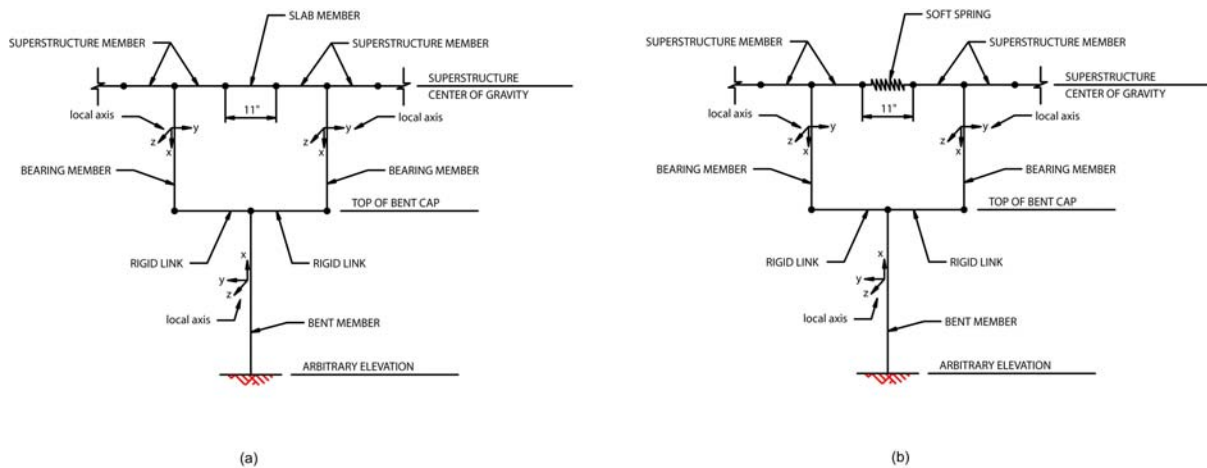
Model of Pier in GTSTRUDL (a) Interior Pier, (b) Expansion Joint Pier
